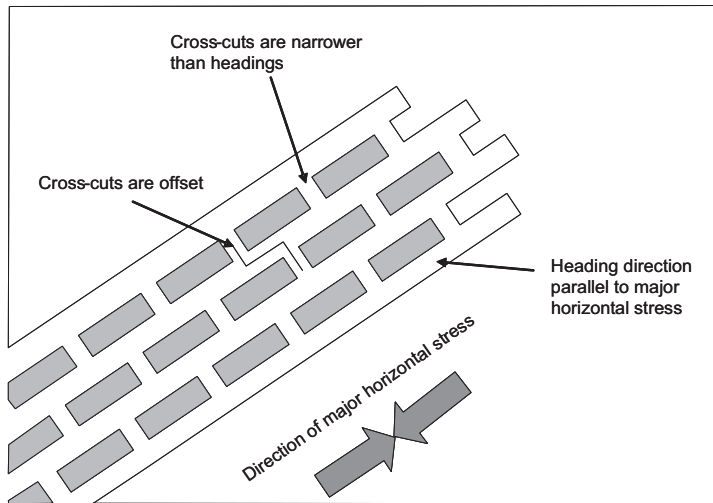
Diagram showing room and pillar layout modified to minimize the potential impact of horizontal stress related damage
